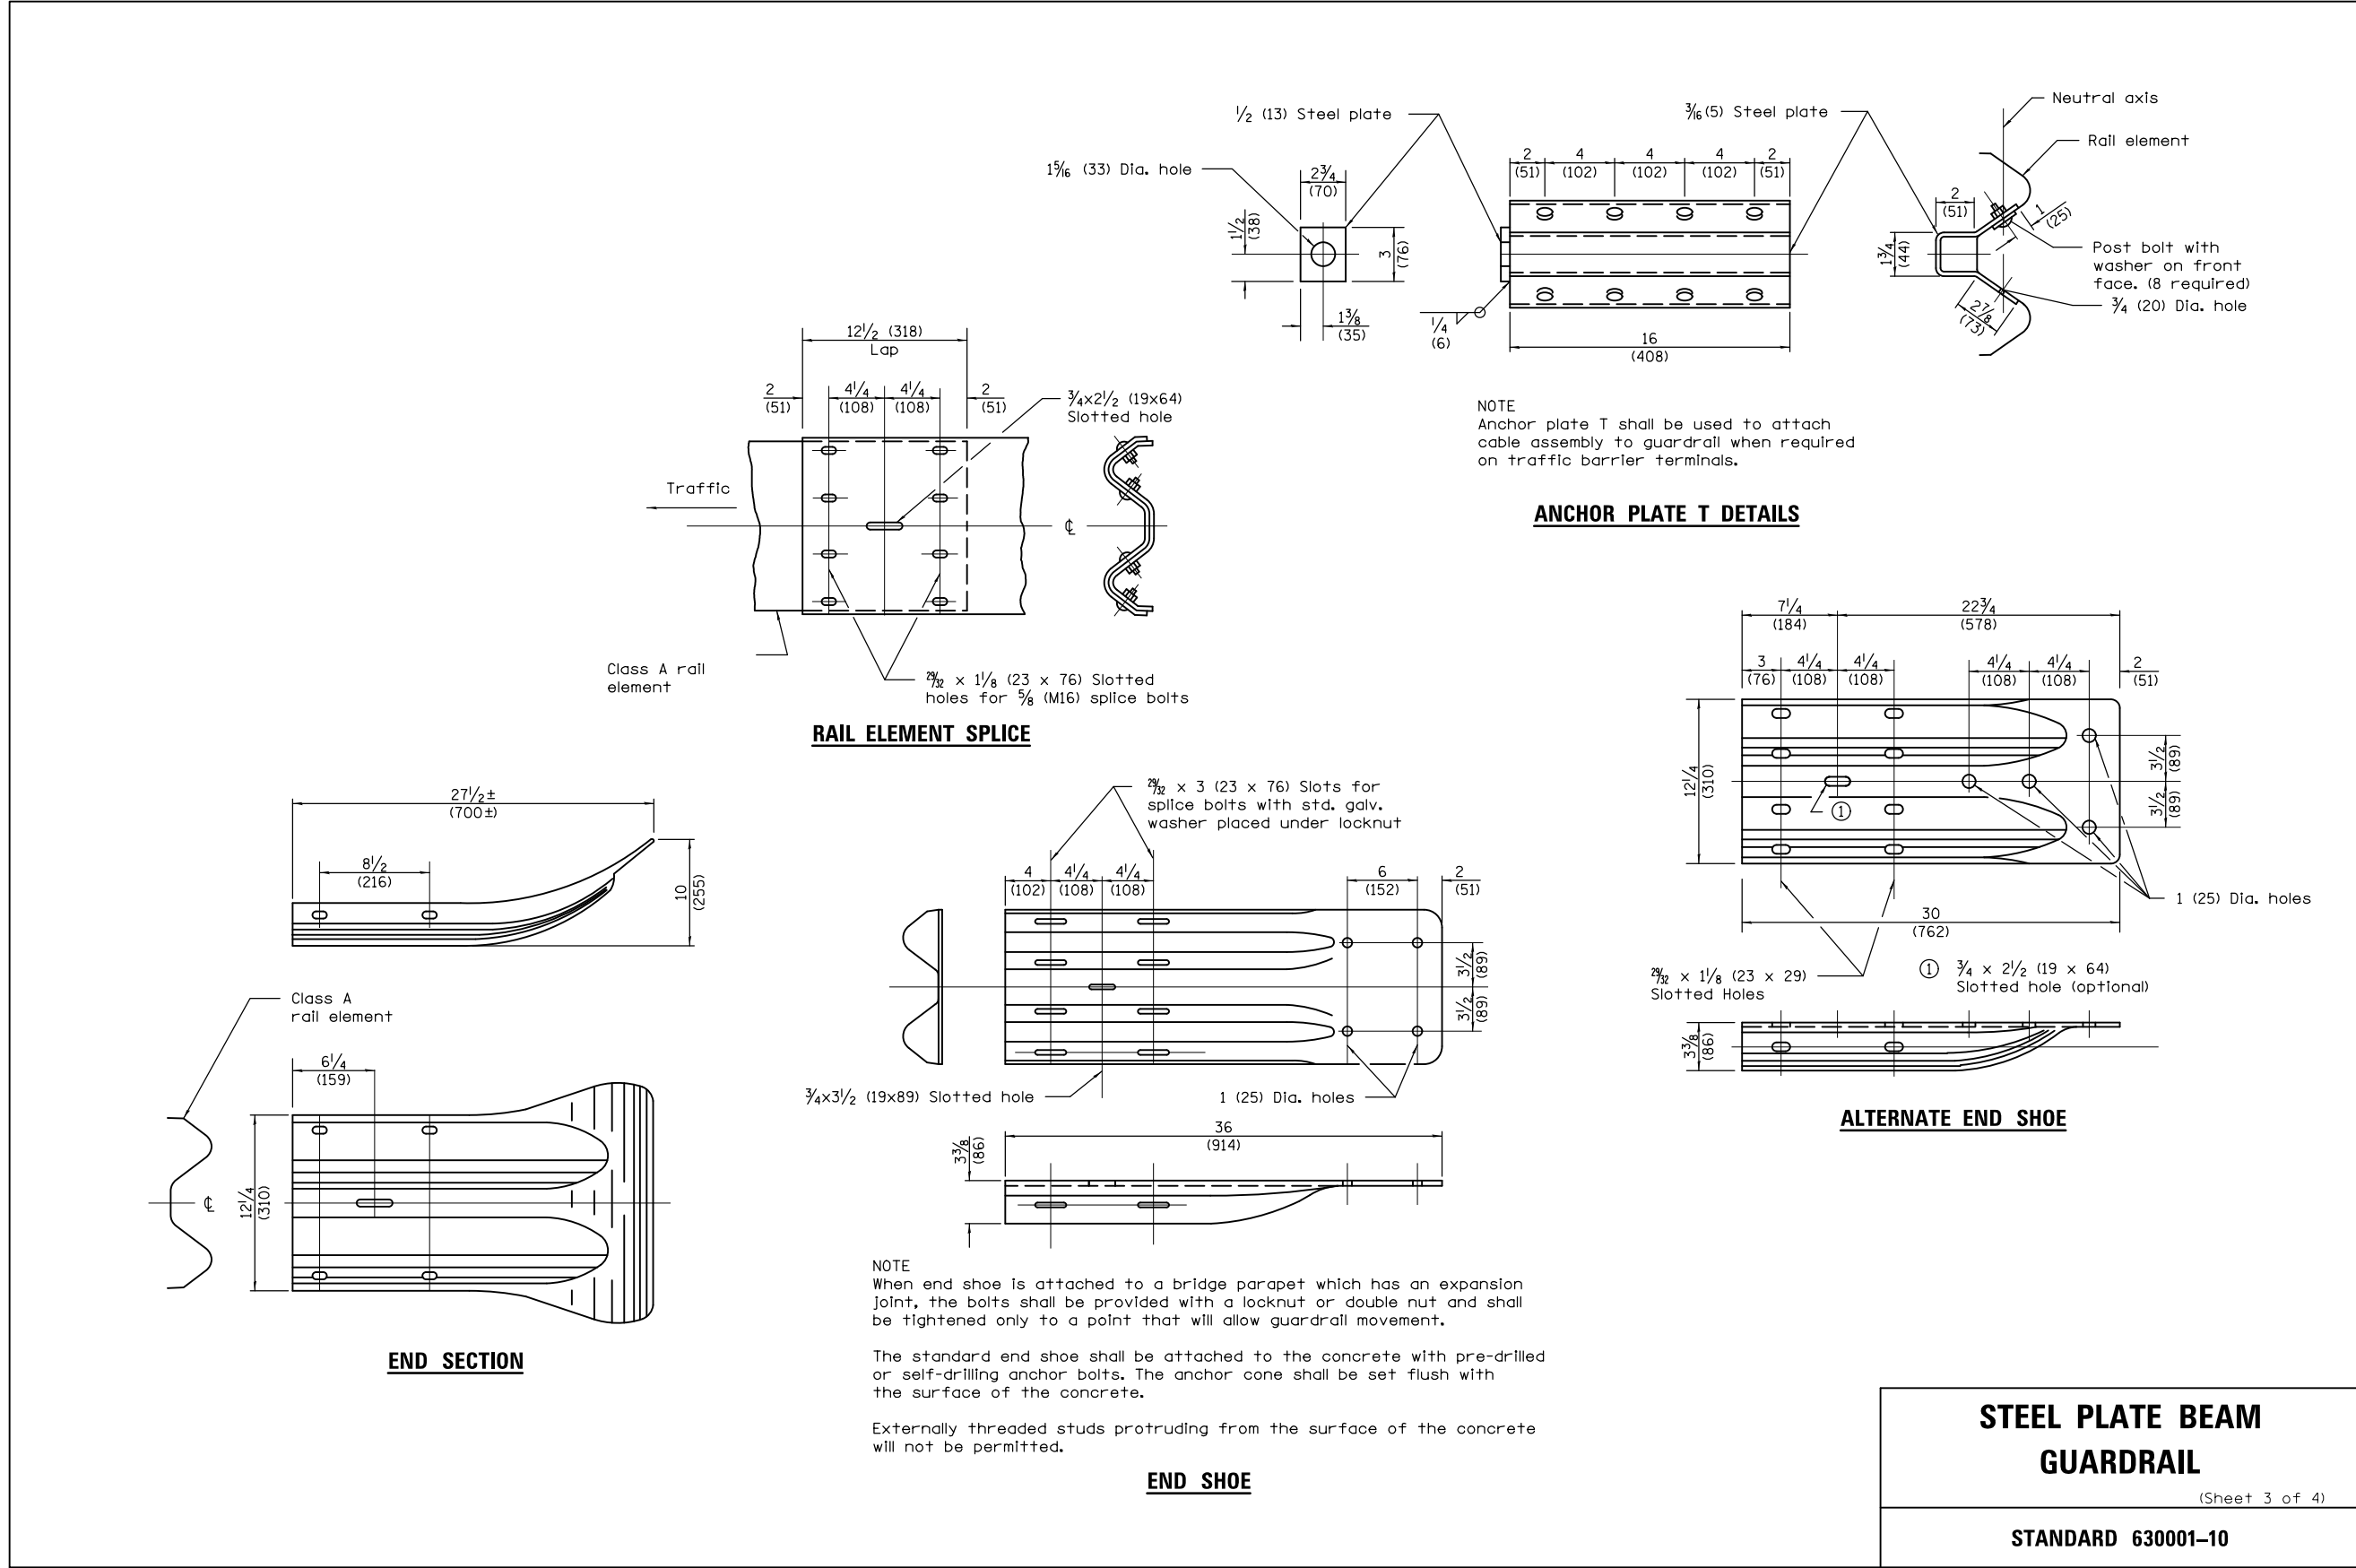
1/2" STEEL PLATE BEAM GUARDRAIL
